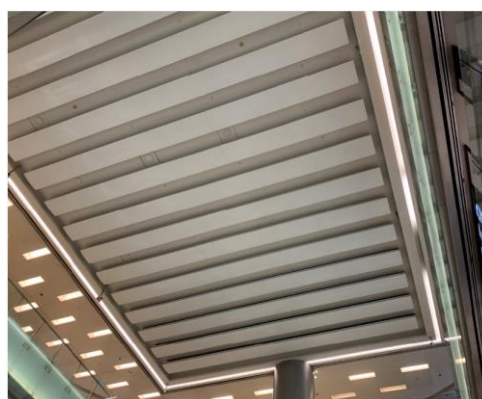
Decorative Suspended Ceiling in Shopping Mall
